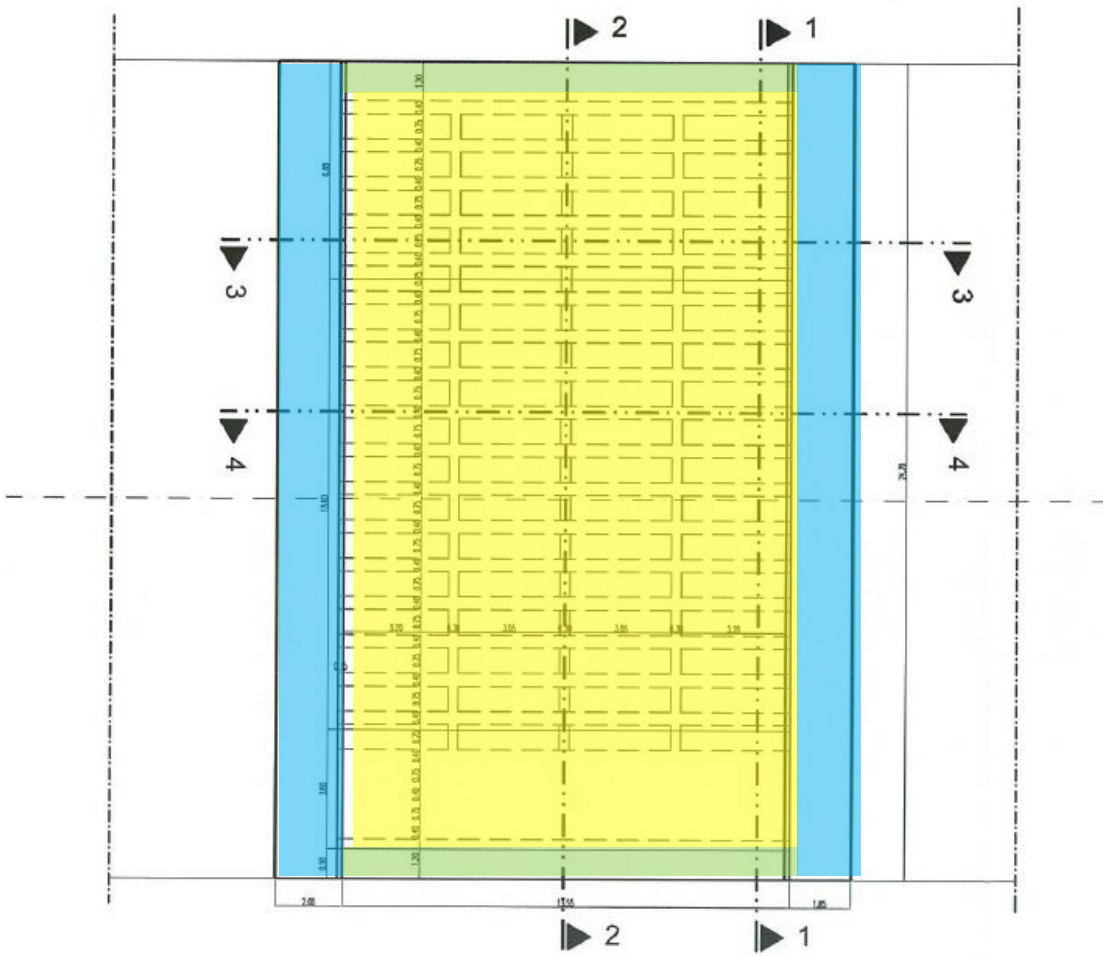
Disposition of cantilever slabs (green), ribbed deck slab (yellow) and abutment walls (blue) in plane of the bridge (upper side)
